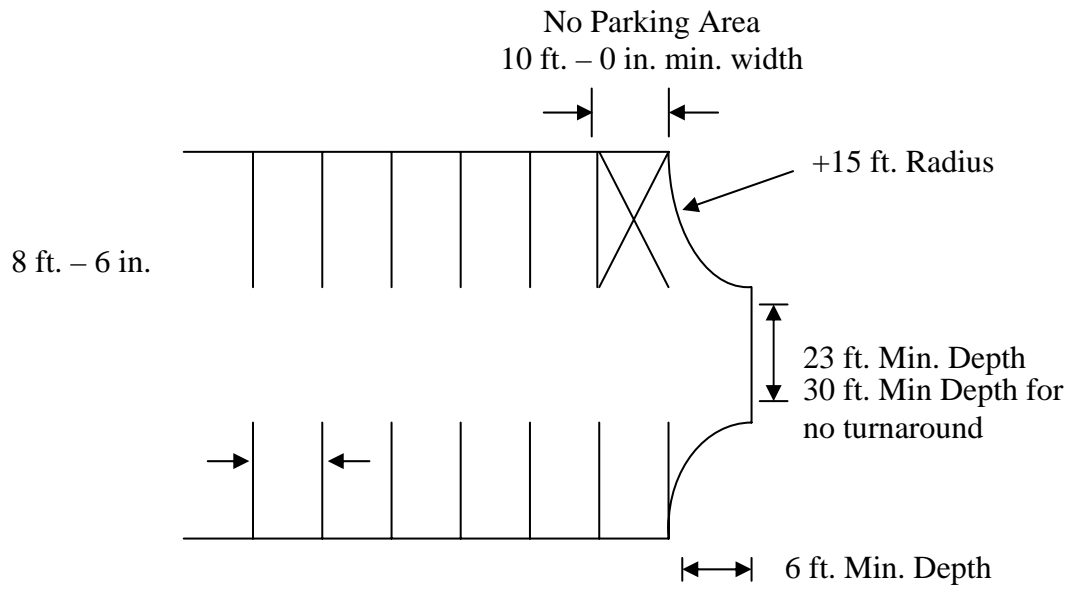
Typical Turnaround Design for 90° Parking Access Drive
